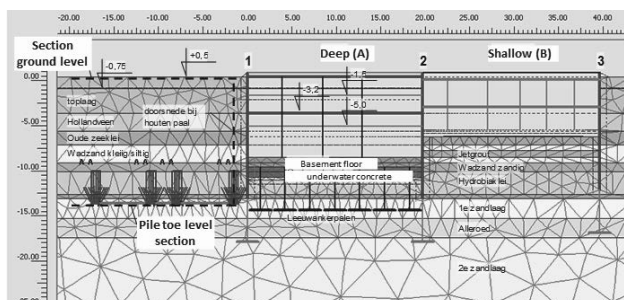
Plaxis geometry section C-C, shallow excavation NAP -6,1m.
